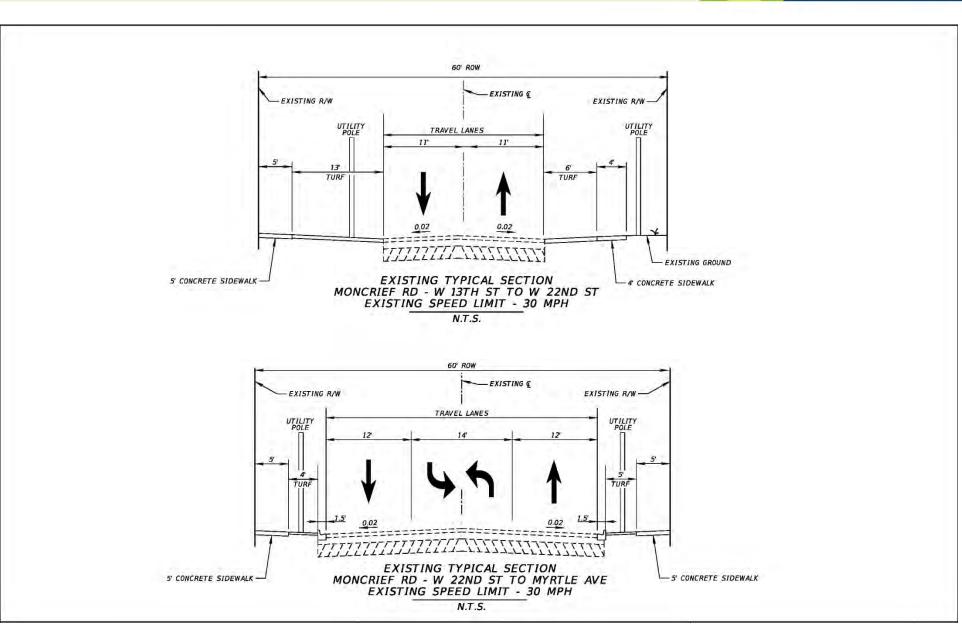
Moncrief Road Typical Sections (13th Street to Myrtle Avenue)
